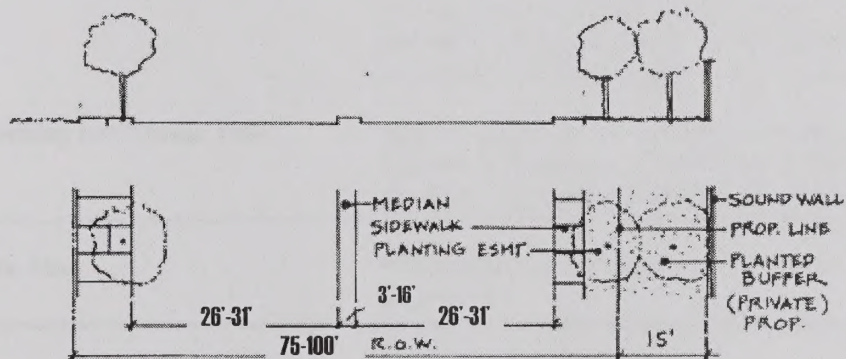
Street Section. Countryside Drive between Tuolumne Road and Fulkerth Road.
